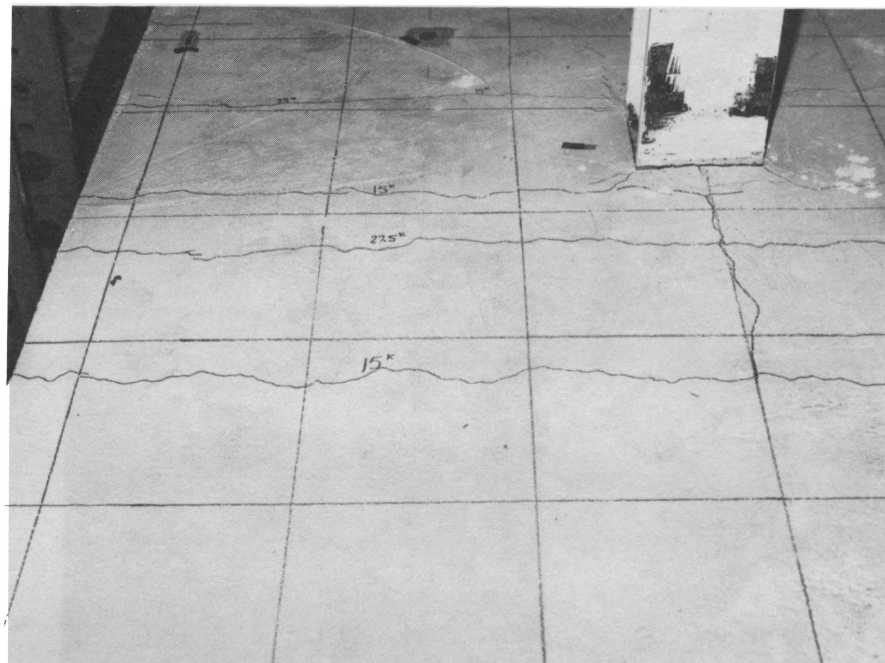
Slab Cracking on Windward Side of Center Column of CA-2
